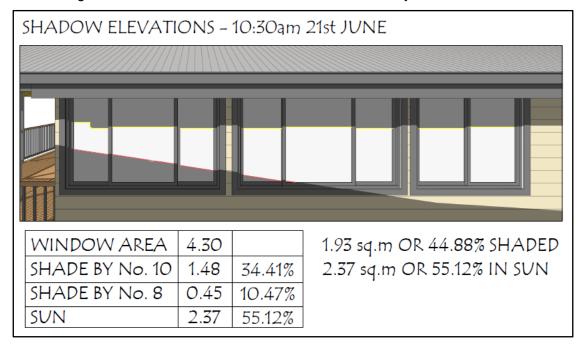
Revised shadow elevations for 10 Admiralty Crescent at 10:30 am
